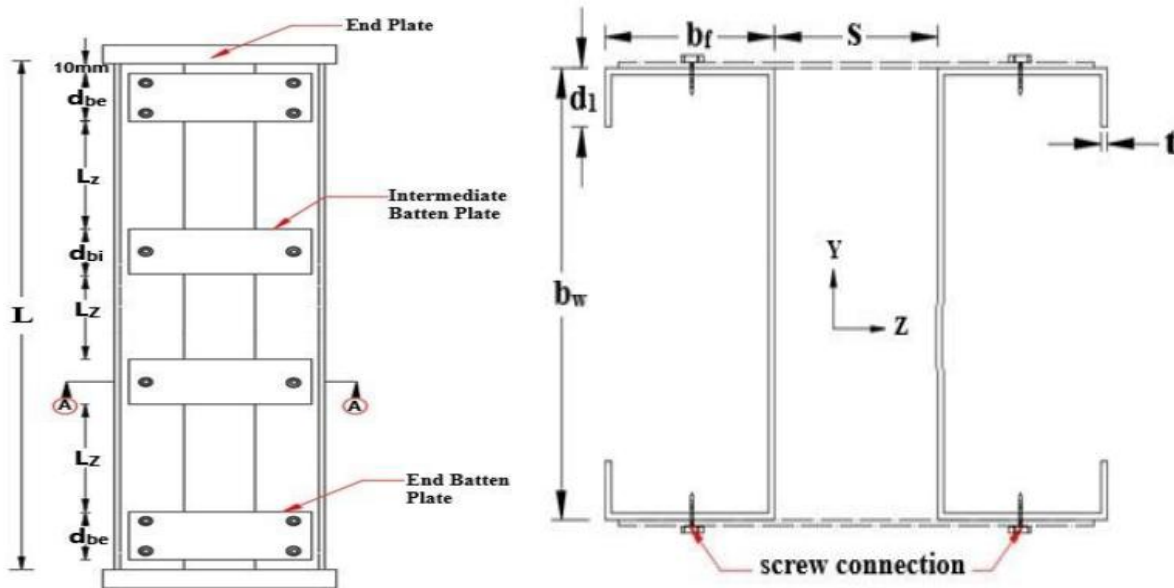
TYPICAL DETAILS OF THE SPECIMEN
